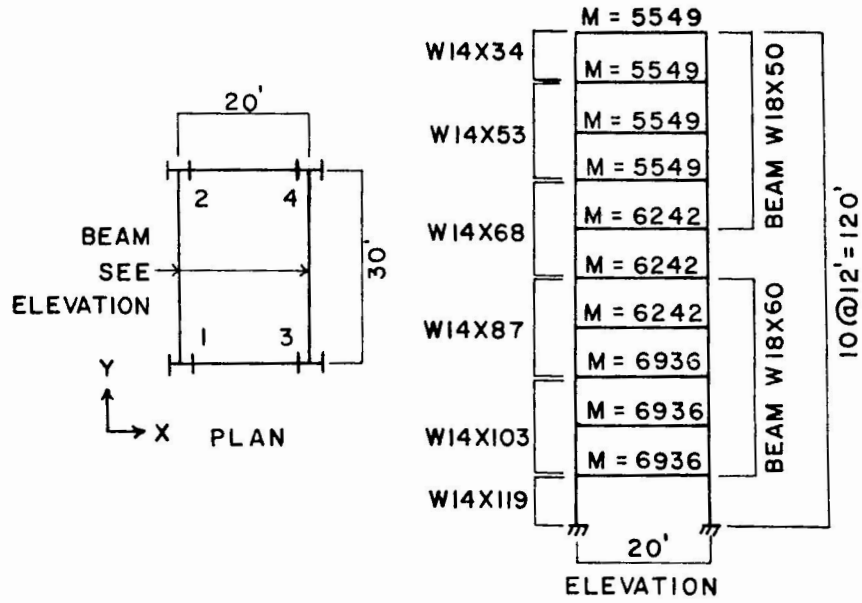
10-Story, 1-Bay 3-D Building System of Example 2
